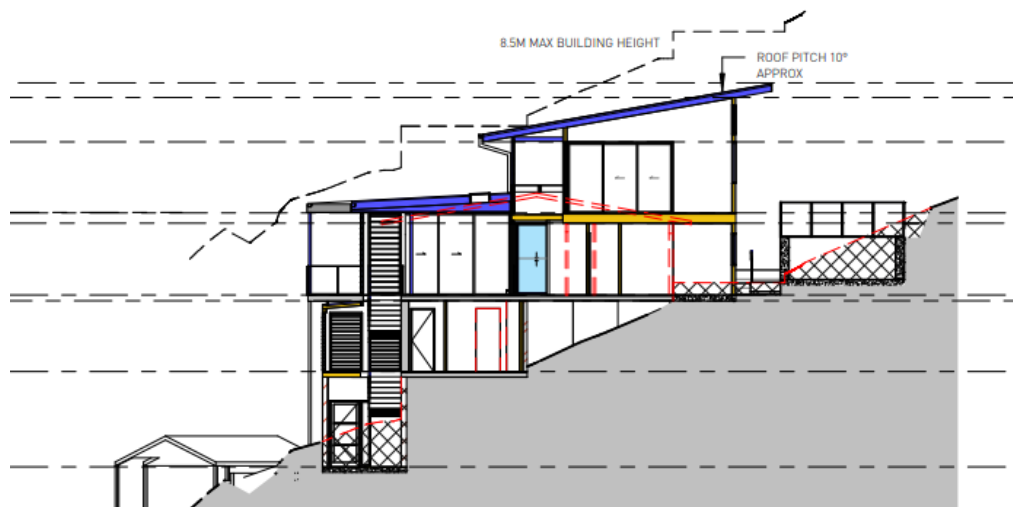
Section of proposed excavation works. (Source: Giles Tribe)
